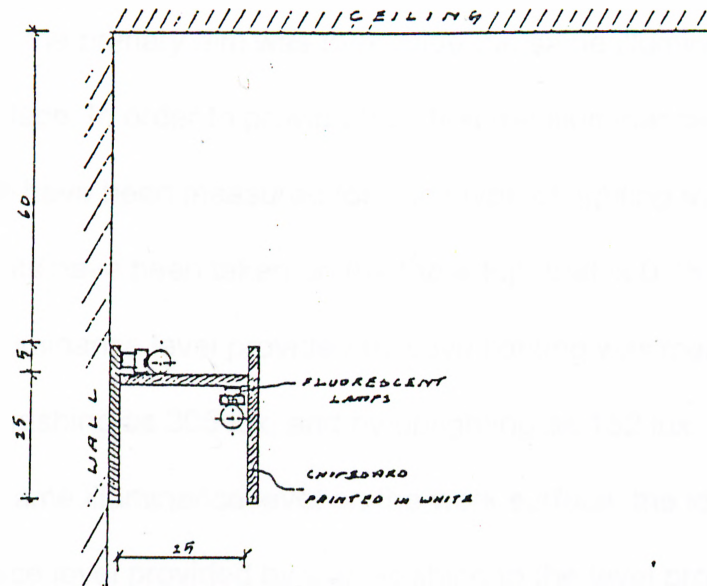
Cove lighting and wall washing installation dimensions.
